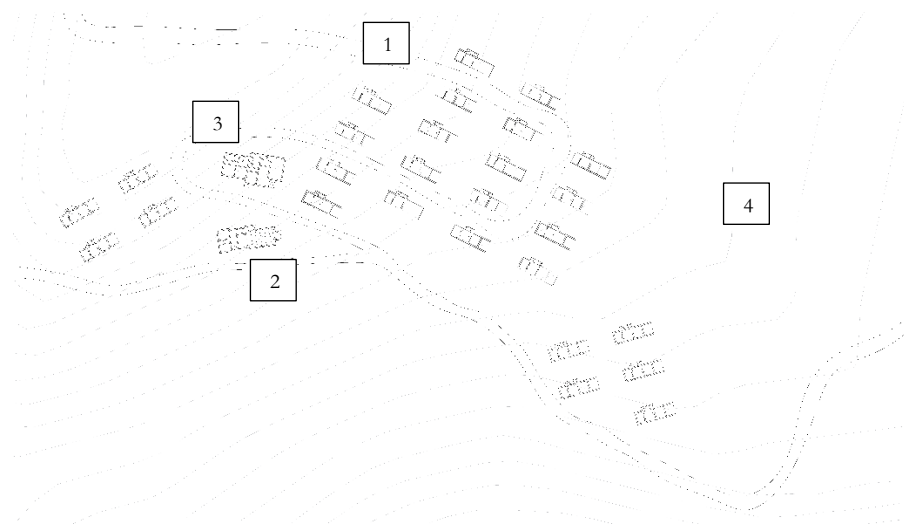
Borgo Morfia site plan: Drawing by author, March 31, 2026.
